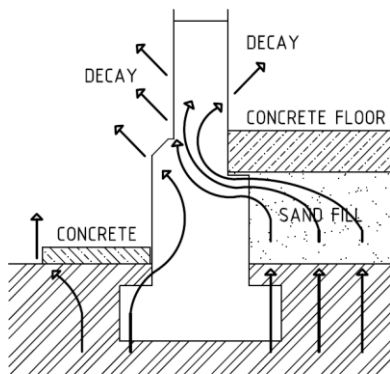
After: concrete slabs prevent evaporation, so soil moisture is forced up the wall
